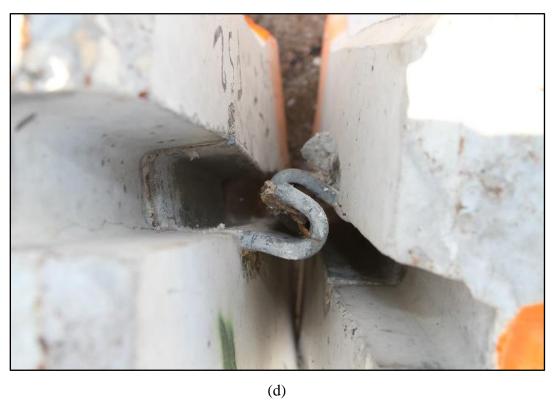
Damaged Portable Concrete Barriers after Test No. 440592-1 (Continued).
